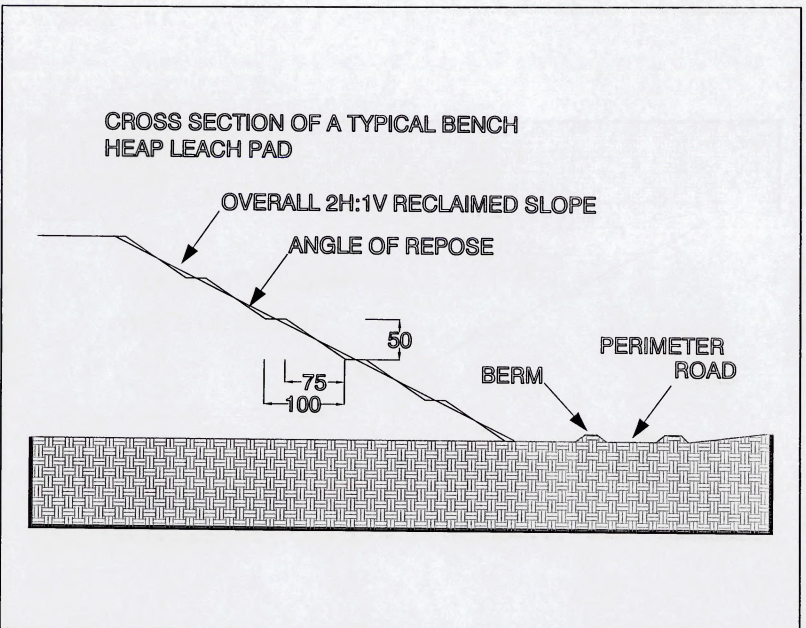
Cross Section of Typical Bench Heap Leach Pile
